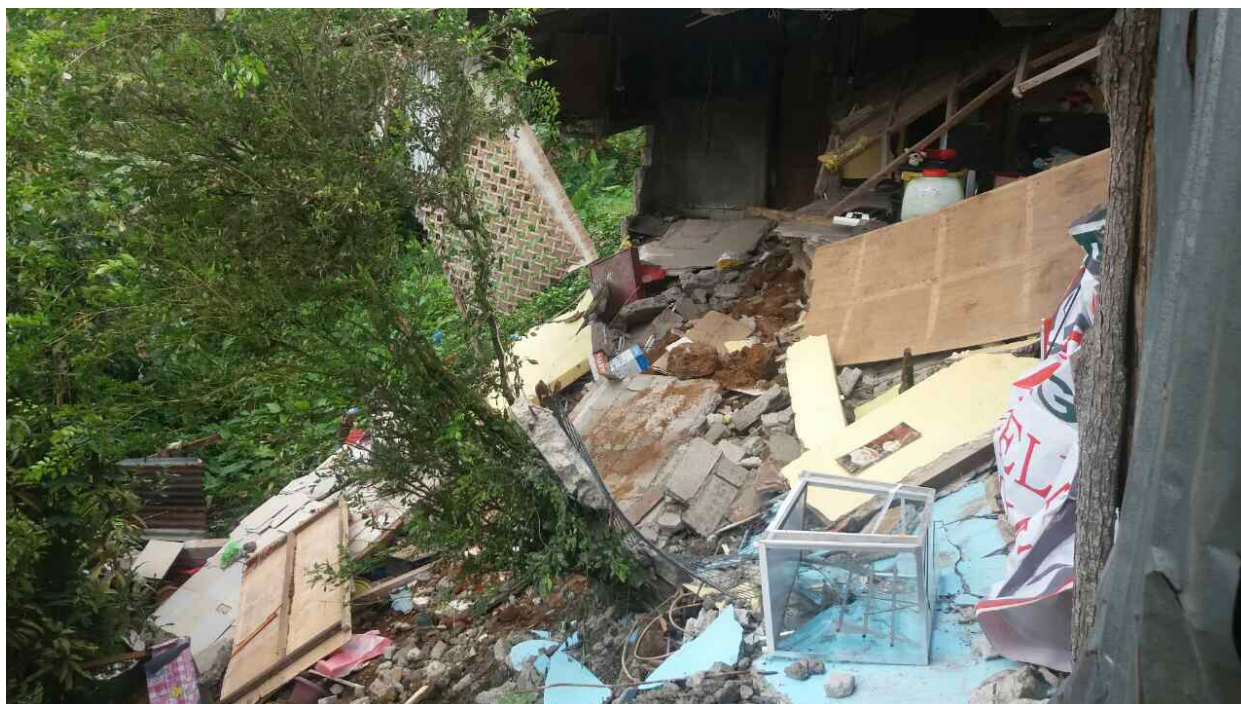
Damaged house in Brgy. Danao, Ormoc City. (Photo by: LCDE)
